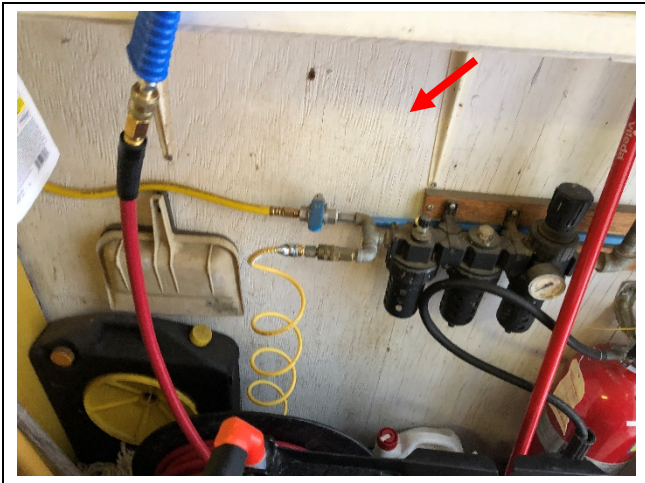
Pier Building – Lead-containing white coloured paint on interior wood board walls.
